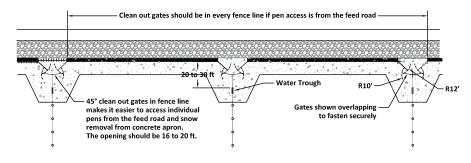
Example of Gate Arrangement to Access Pens Along the Feed Road
